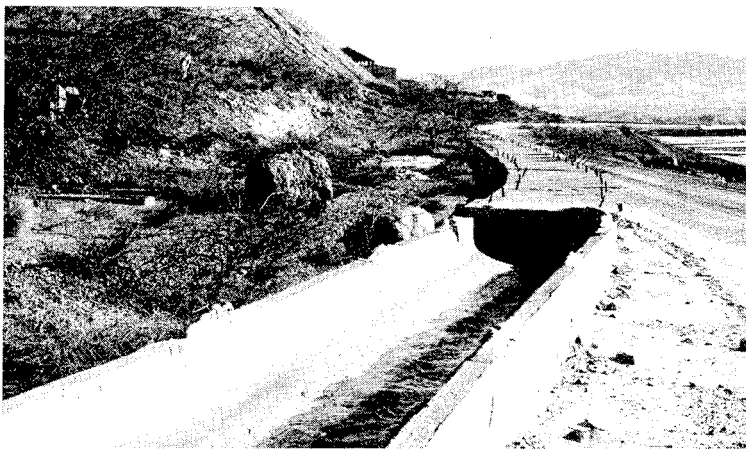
PHOTO A. TYPICAL CONCRETE LAUNDER USED AT MORENCI, ARIZONA FOR TRANSPORTING TAILINGS.
